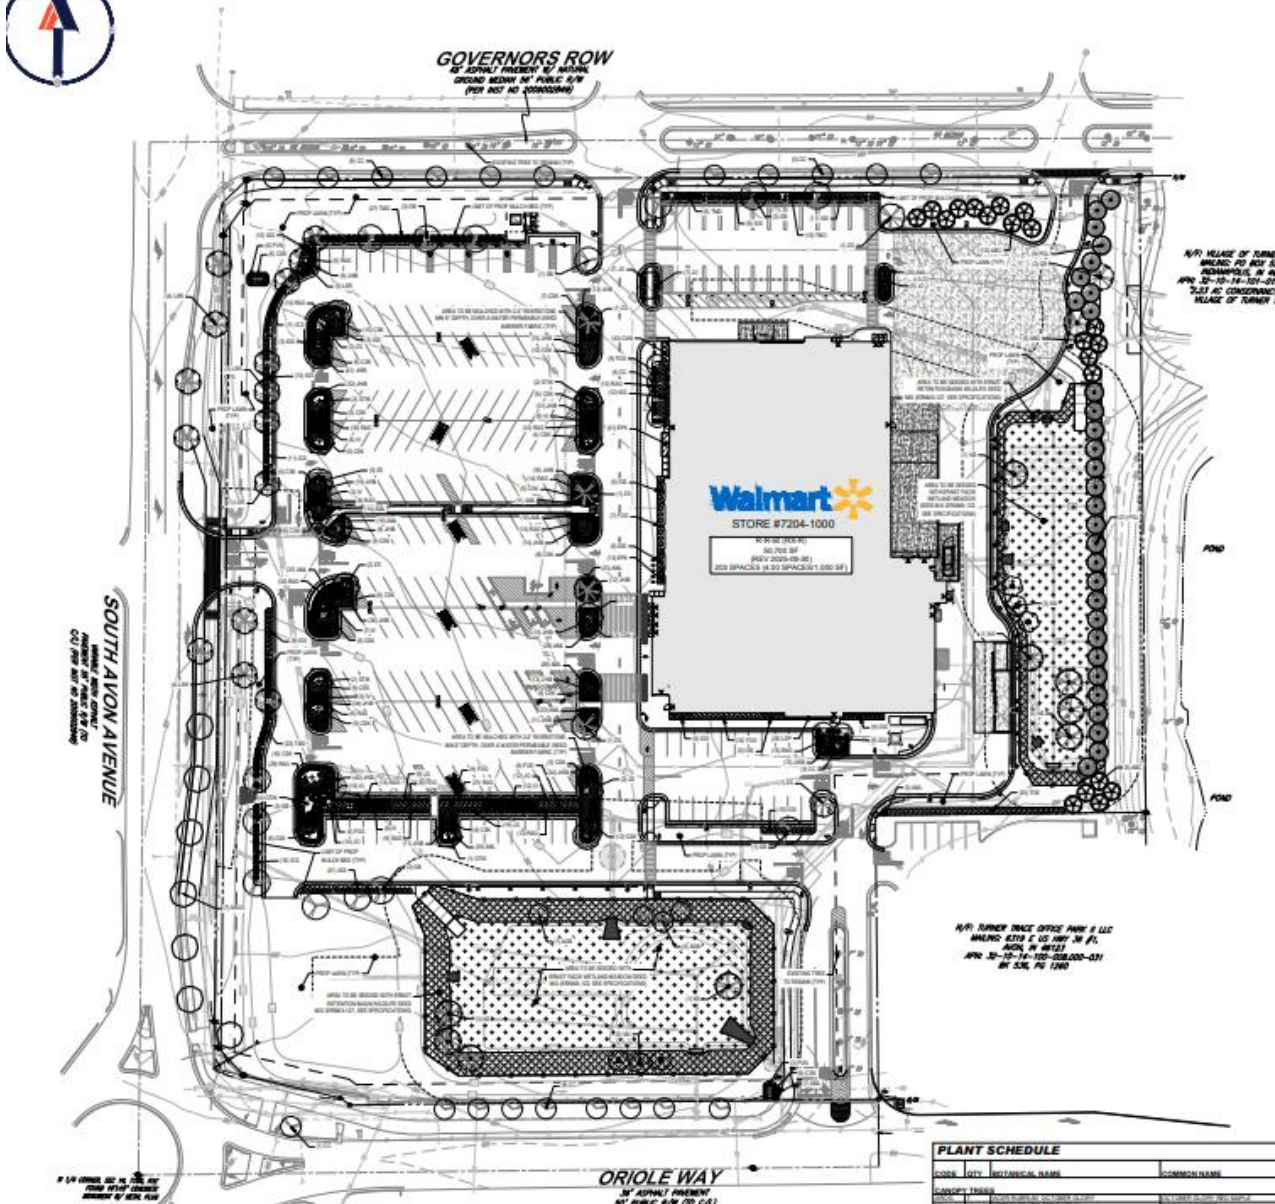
Revised Landscape Plan (2-January-2026)
